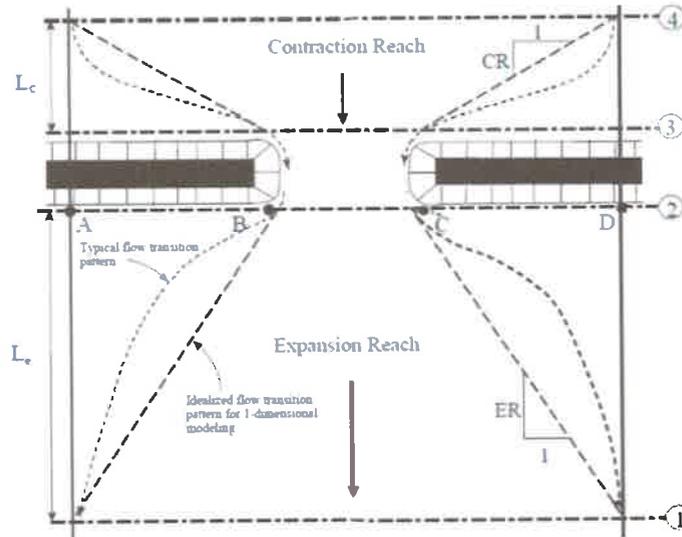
Cross Section Locations at a Bridge or Culvert
